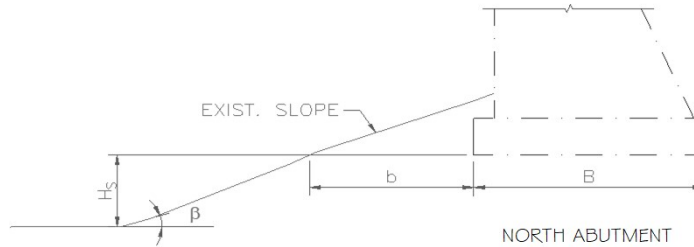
1—Definition of Footing and Slope Geometric Parameters for Determination of RCBC
